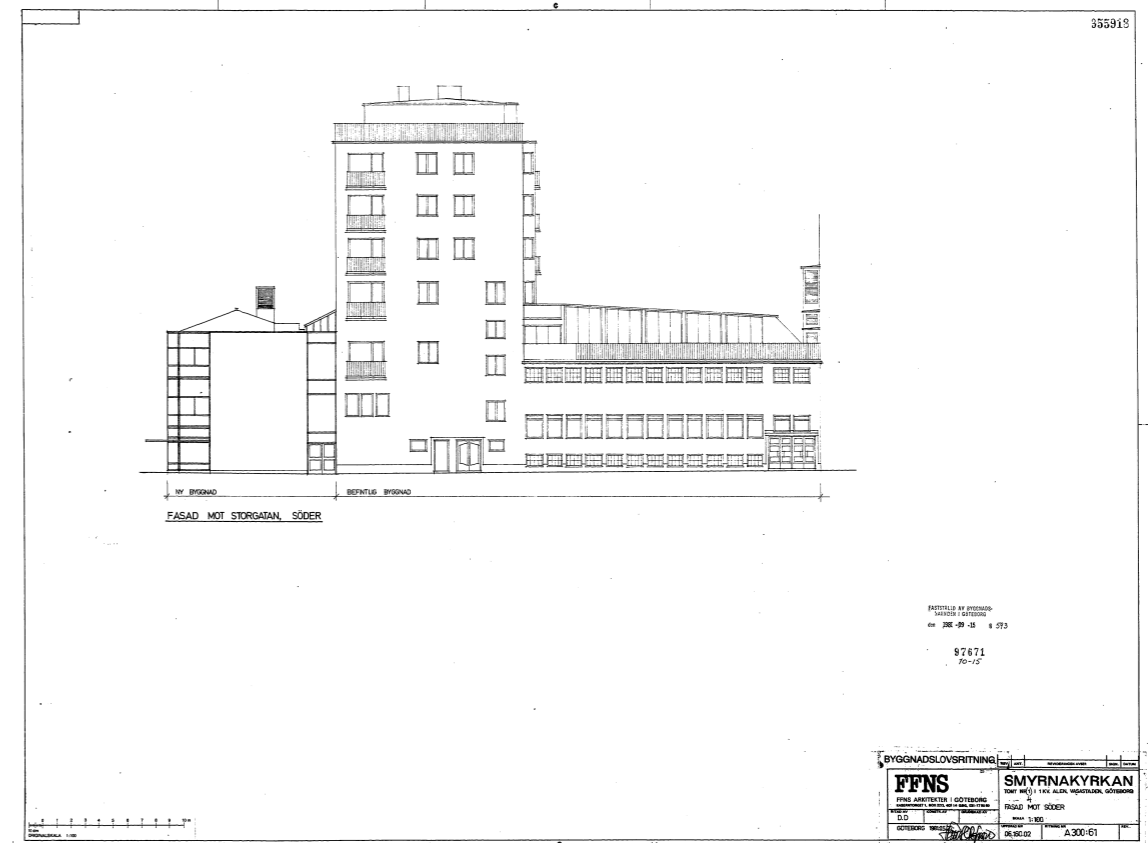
South elevation. Original drawing (1981) (Göteborgs Stad., n.d.)
